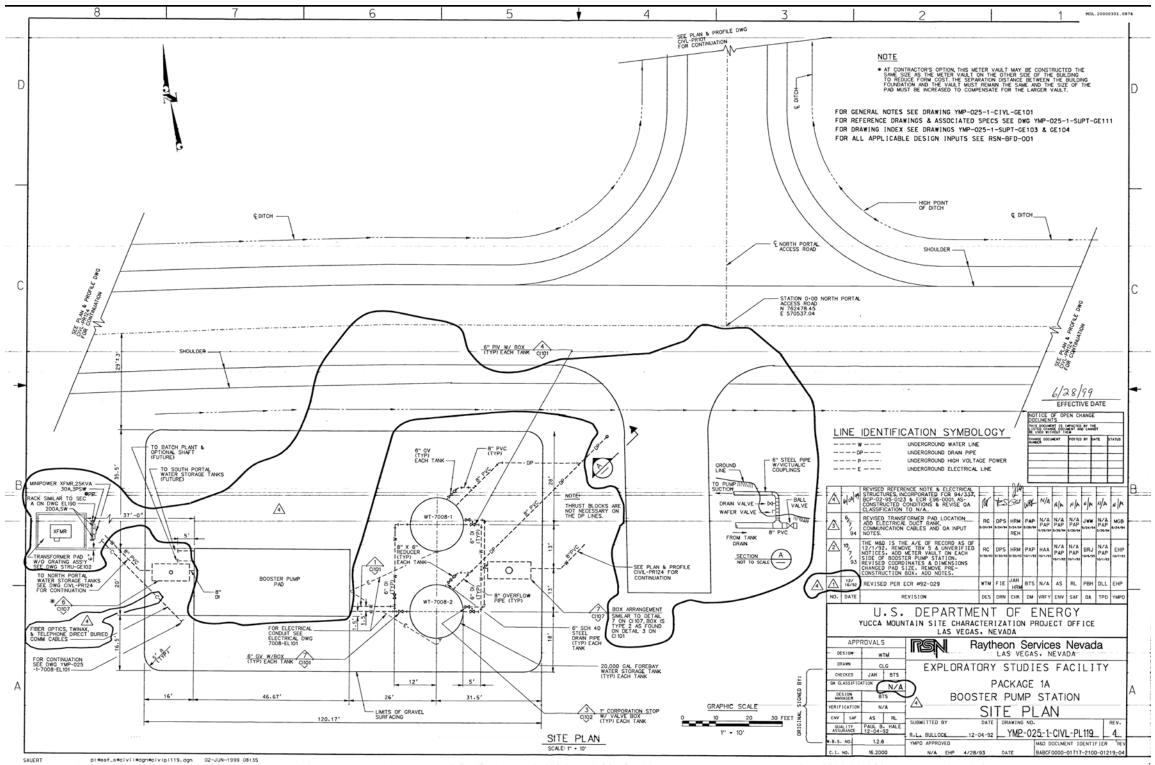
Exploratory Studies Facility Package 1A Booster Pump Station Site Plan
